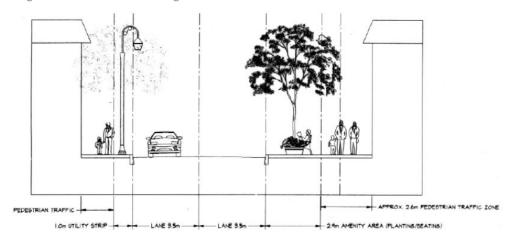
Cross section at the bulb out – Parking on one side of Mill Street
